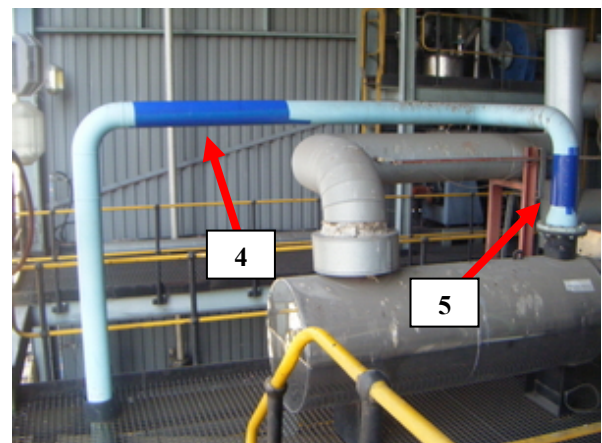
XPlate™ installation site at the secondary air pipe before the heater
